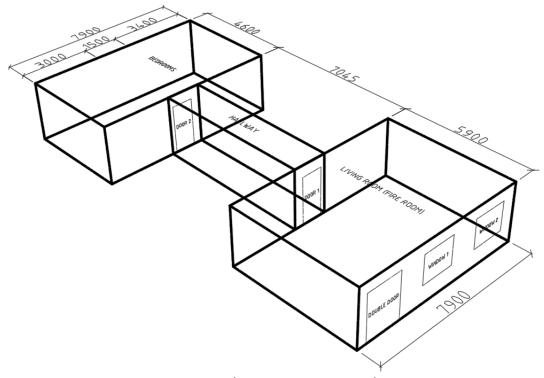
Modelled Floor Plan in B-RISK (perspective, not on scale)
